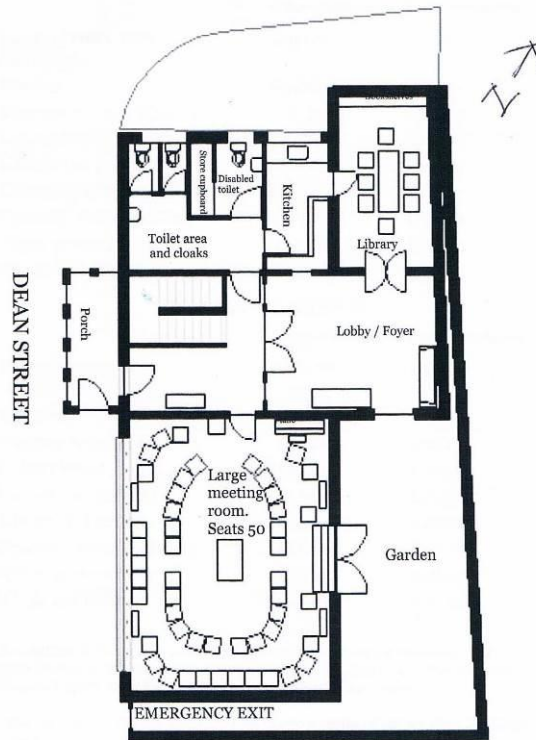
ground floor plan of meeting house (Bangor Meeting)
